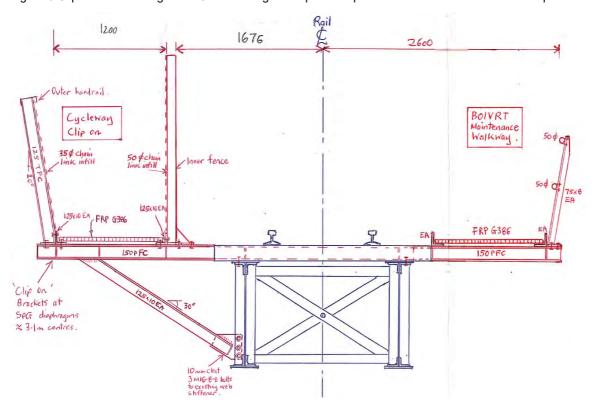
Clip on section at spans 2 and 3 of Rail Bridge 12 BOIVR Whangae.
